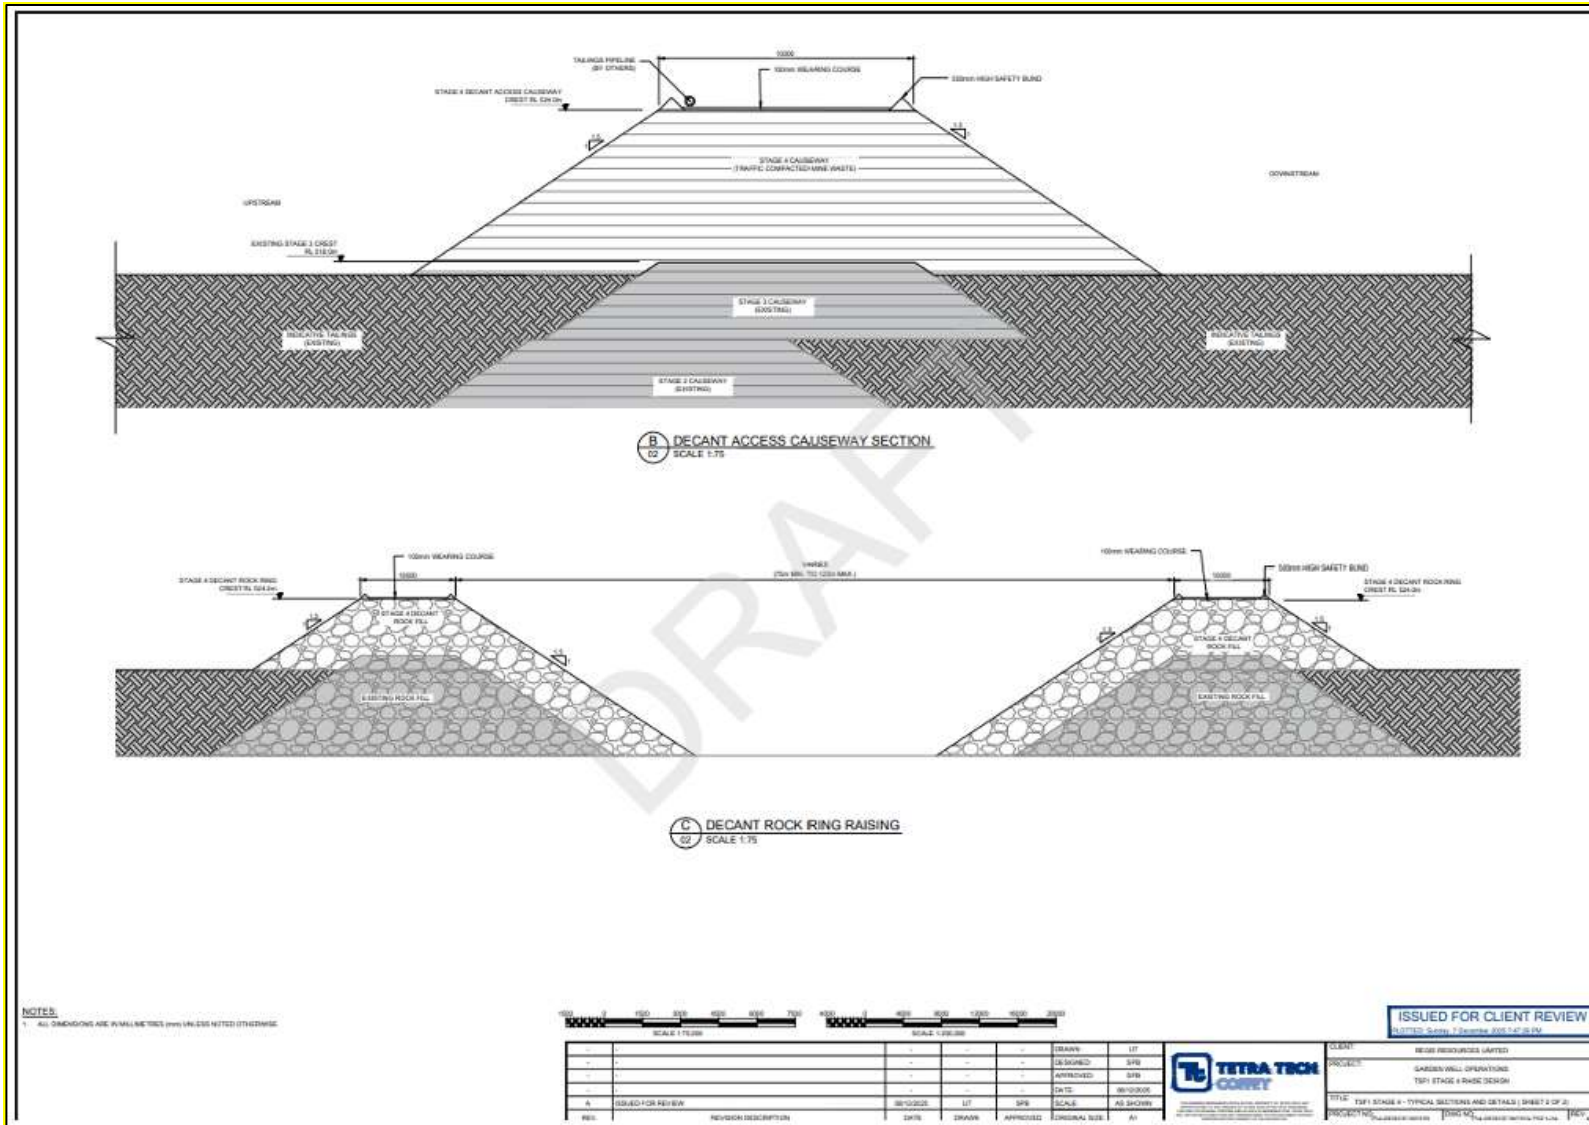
Cross Sections of the Decant Causeway Raise and Decant Rock Ring Raise for Garden Well TSF1 stage4
